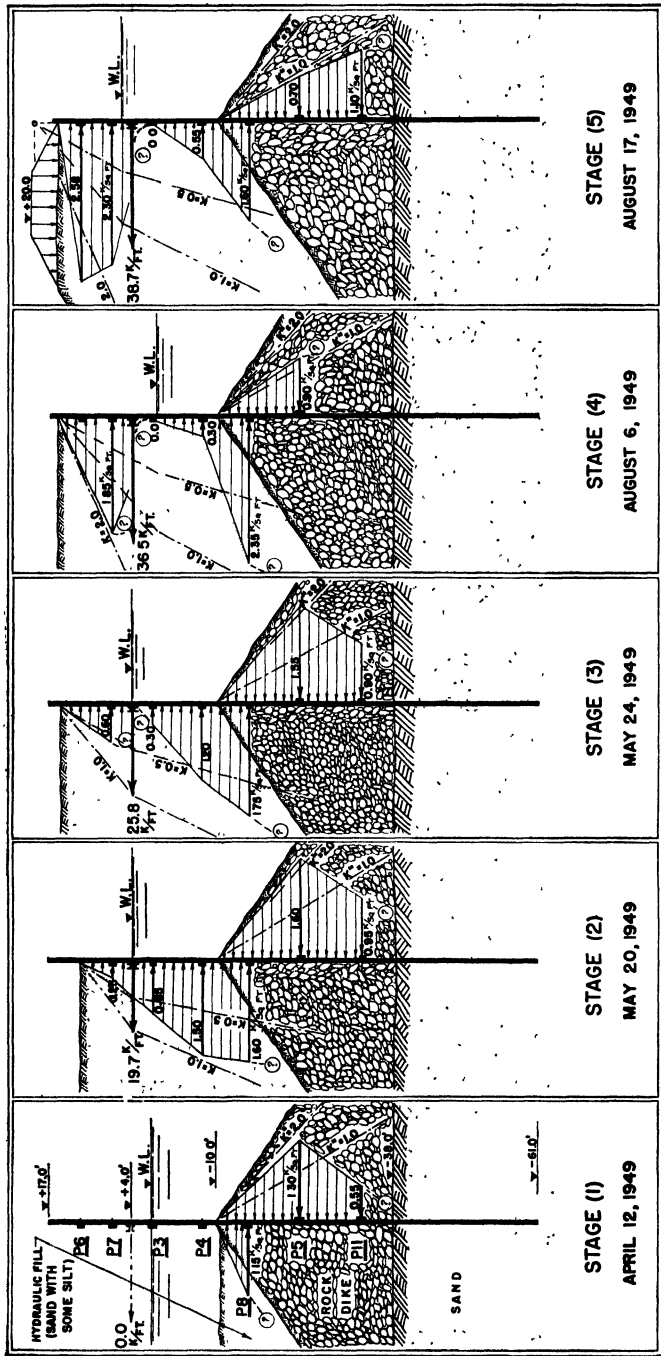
Analysis of the Long Beach Pier C bulkhead-test data. The observed redistribution of lateral pressures after consolidation of the hydraulic fill is attributed to overloading of the anchors, which produces a tendency of the wale to move inward, with resulting accentuation of horizontal arching above the anchor level, of the type illustrated by Fig. 16-26. (From Tschebotarioff, Ref. 399, 1950—discussion of C. Martin Duke's Ref. 110, 1950.)
